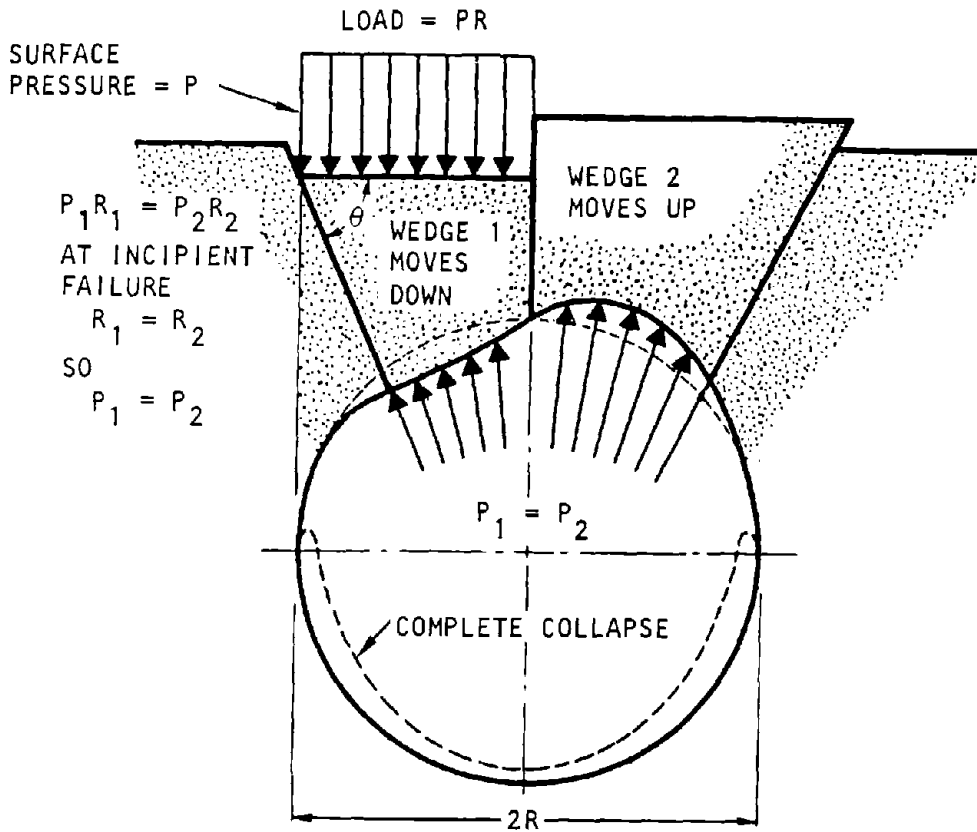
Sliding Wedge Theory of Failure of Buried Flexible Conduit Due to Surface Pressure P above Half of Cylindrical Conduit (Watkins, 1964)
